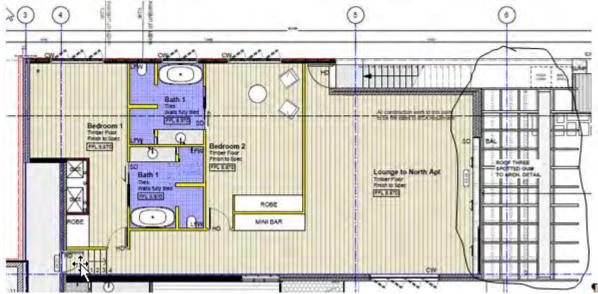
excerpt from approved Level 1 floor plan (Revision A 24/10/2014)
